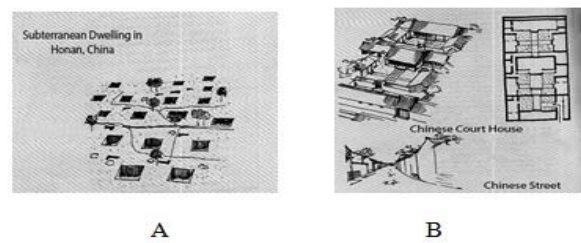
(A-B) Typical layout of Chinese dwelling and courtyard houses (Schoenauer, 1962).
